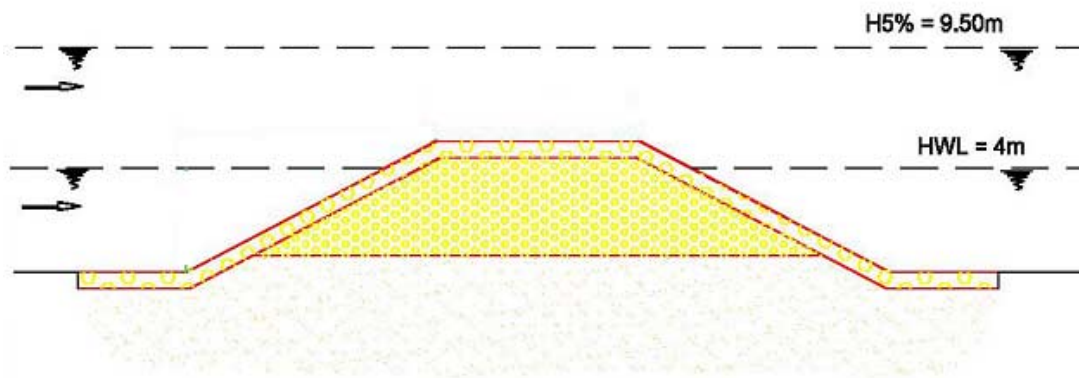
(2) Conceptual Cross-Sectional View of Submerged Weir
